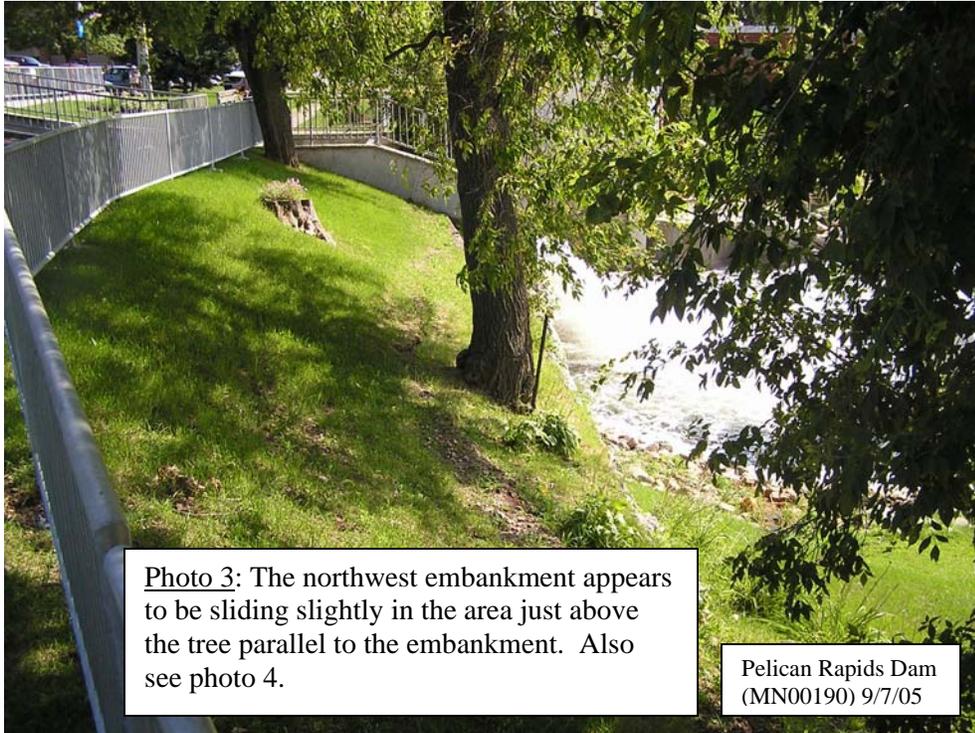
The northwest embankment appears to be sliding slightly in the area just above the tree parallel to the embankment. Also see photo 4.
